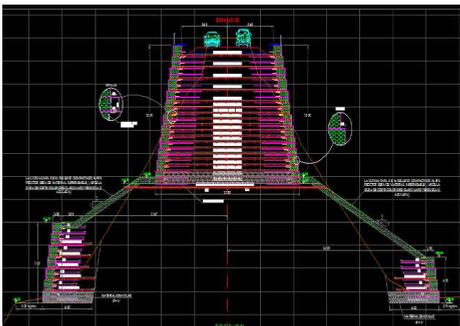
Reinforced Soil Wall critical Section of Garganta del Diablo
